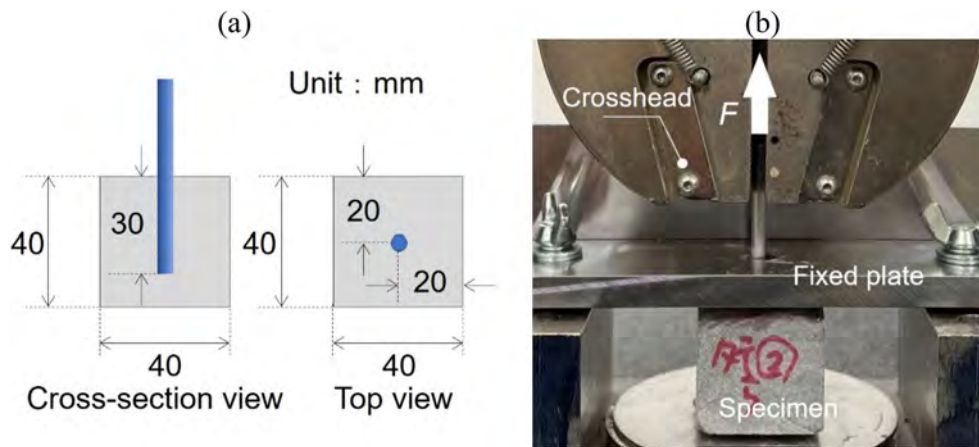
Pullout test on pin embedded into a cube specimen: (a) geometry of the samples; (b) pullout device used to perform the tests.
